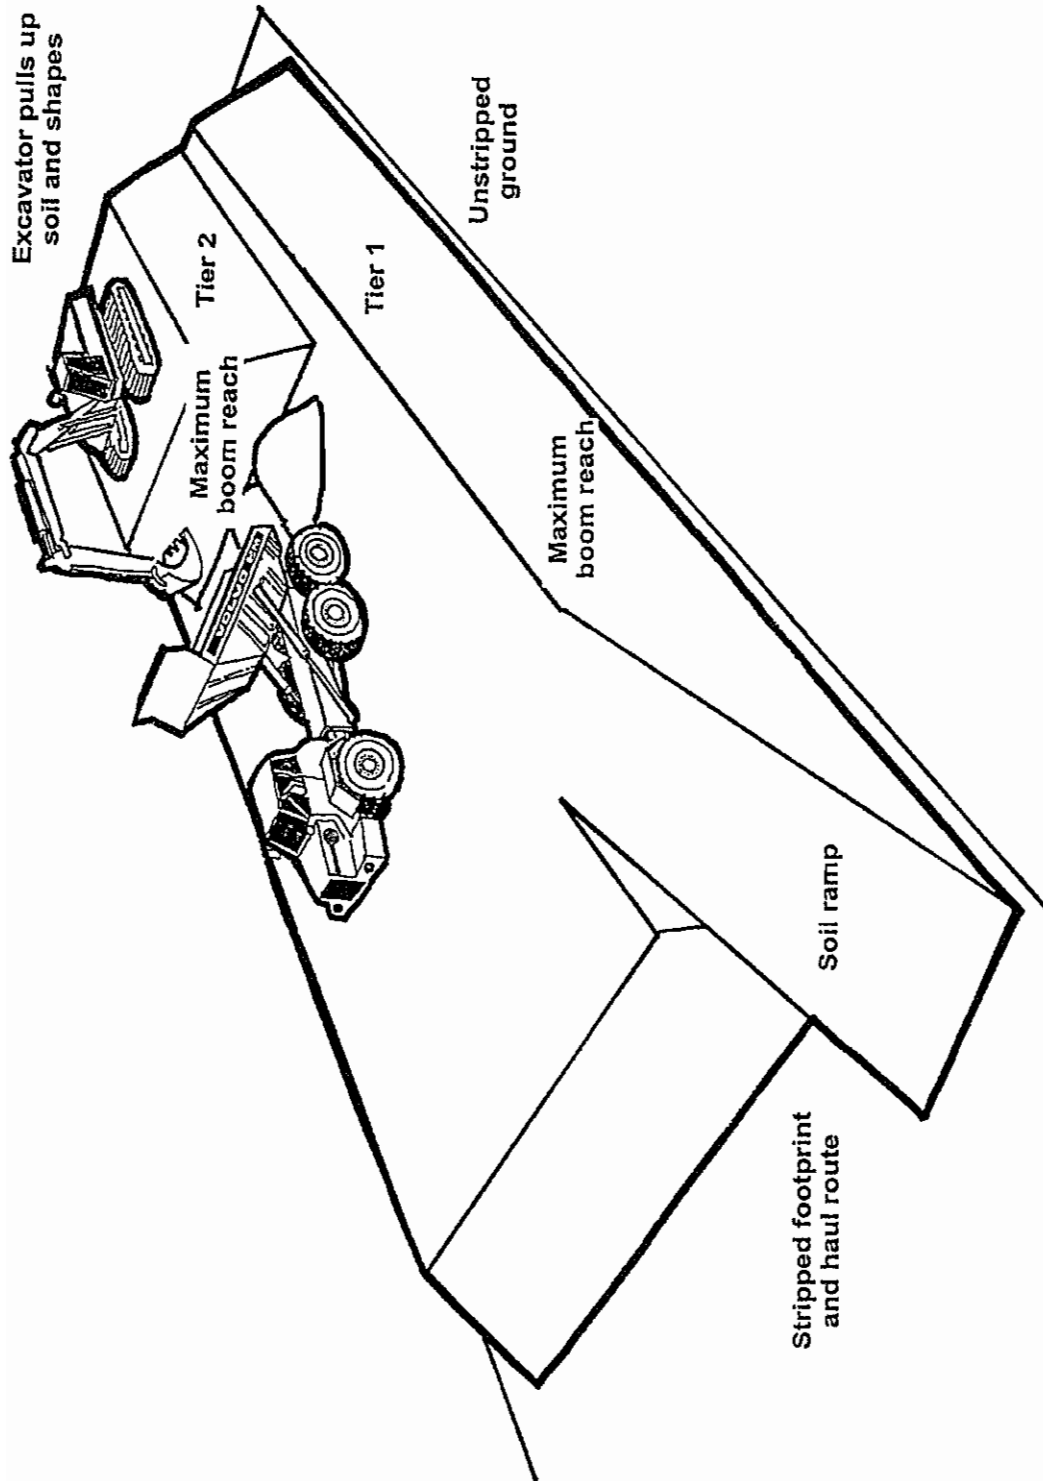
Soil storage mound construction with excavators and dump trucks:
